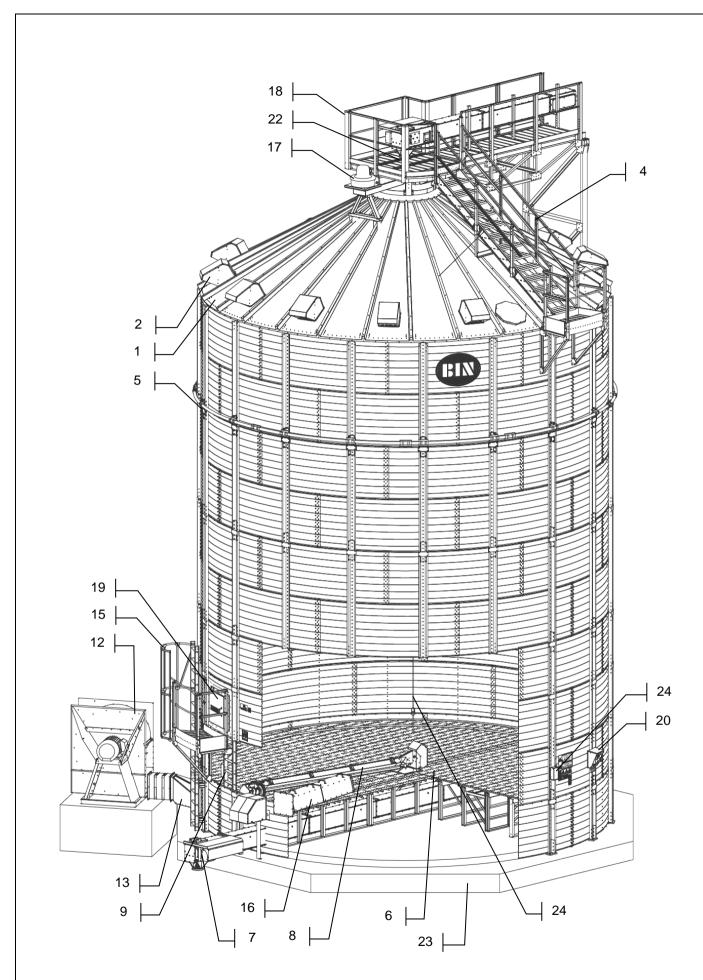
A diagram of a silo of the FBIN type, with steel floor on concrete blocks, and with standard and optional equipment.
